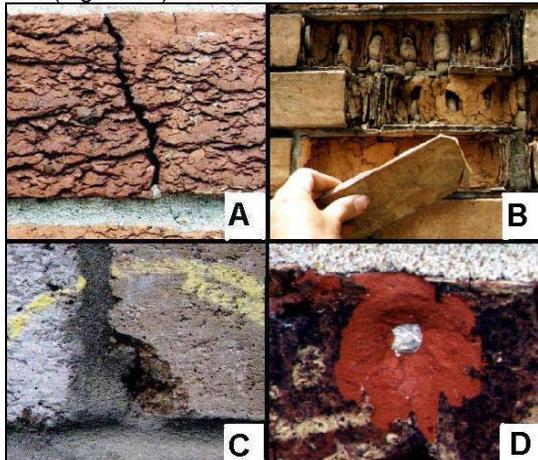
Brick deficiencies not caused by wind: A) shrinkage crack, B) face separation, C) mortar over chipped brick, and D) spalling at a mineral spot.
